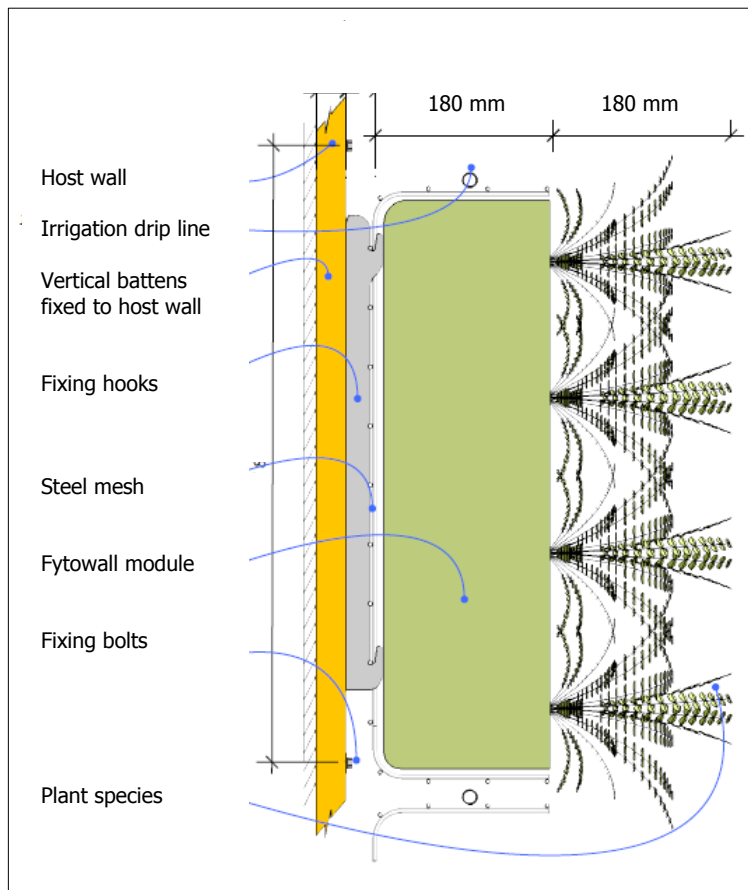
vertical detail fytowall-fytogreen system (source: www.fytowall.com).
